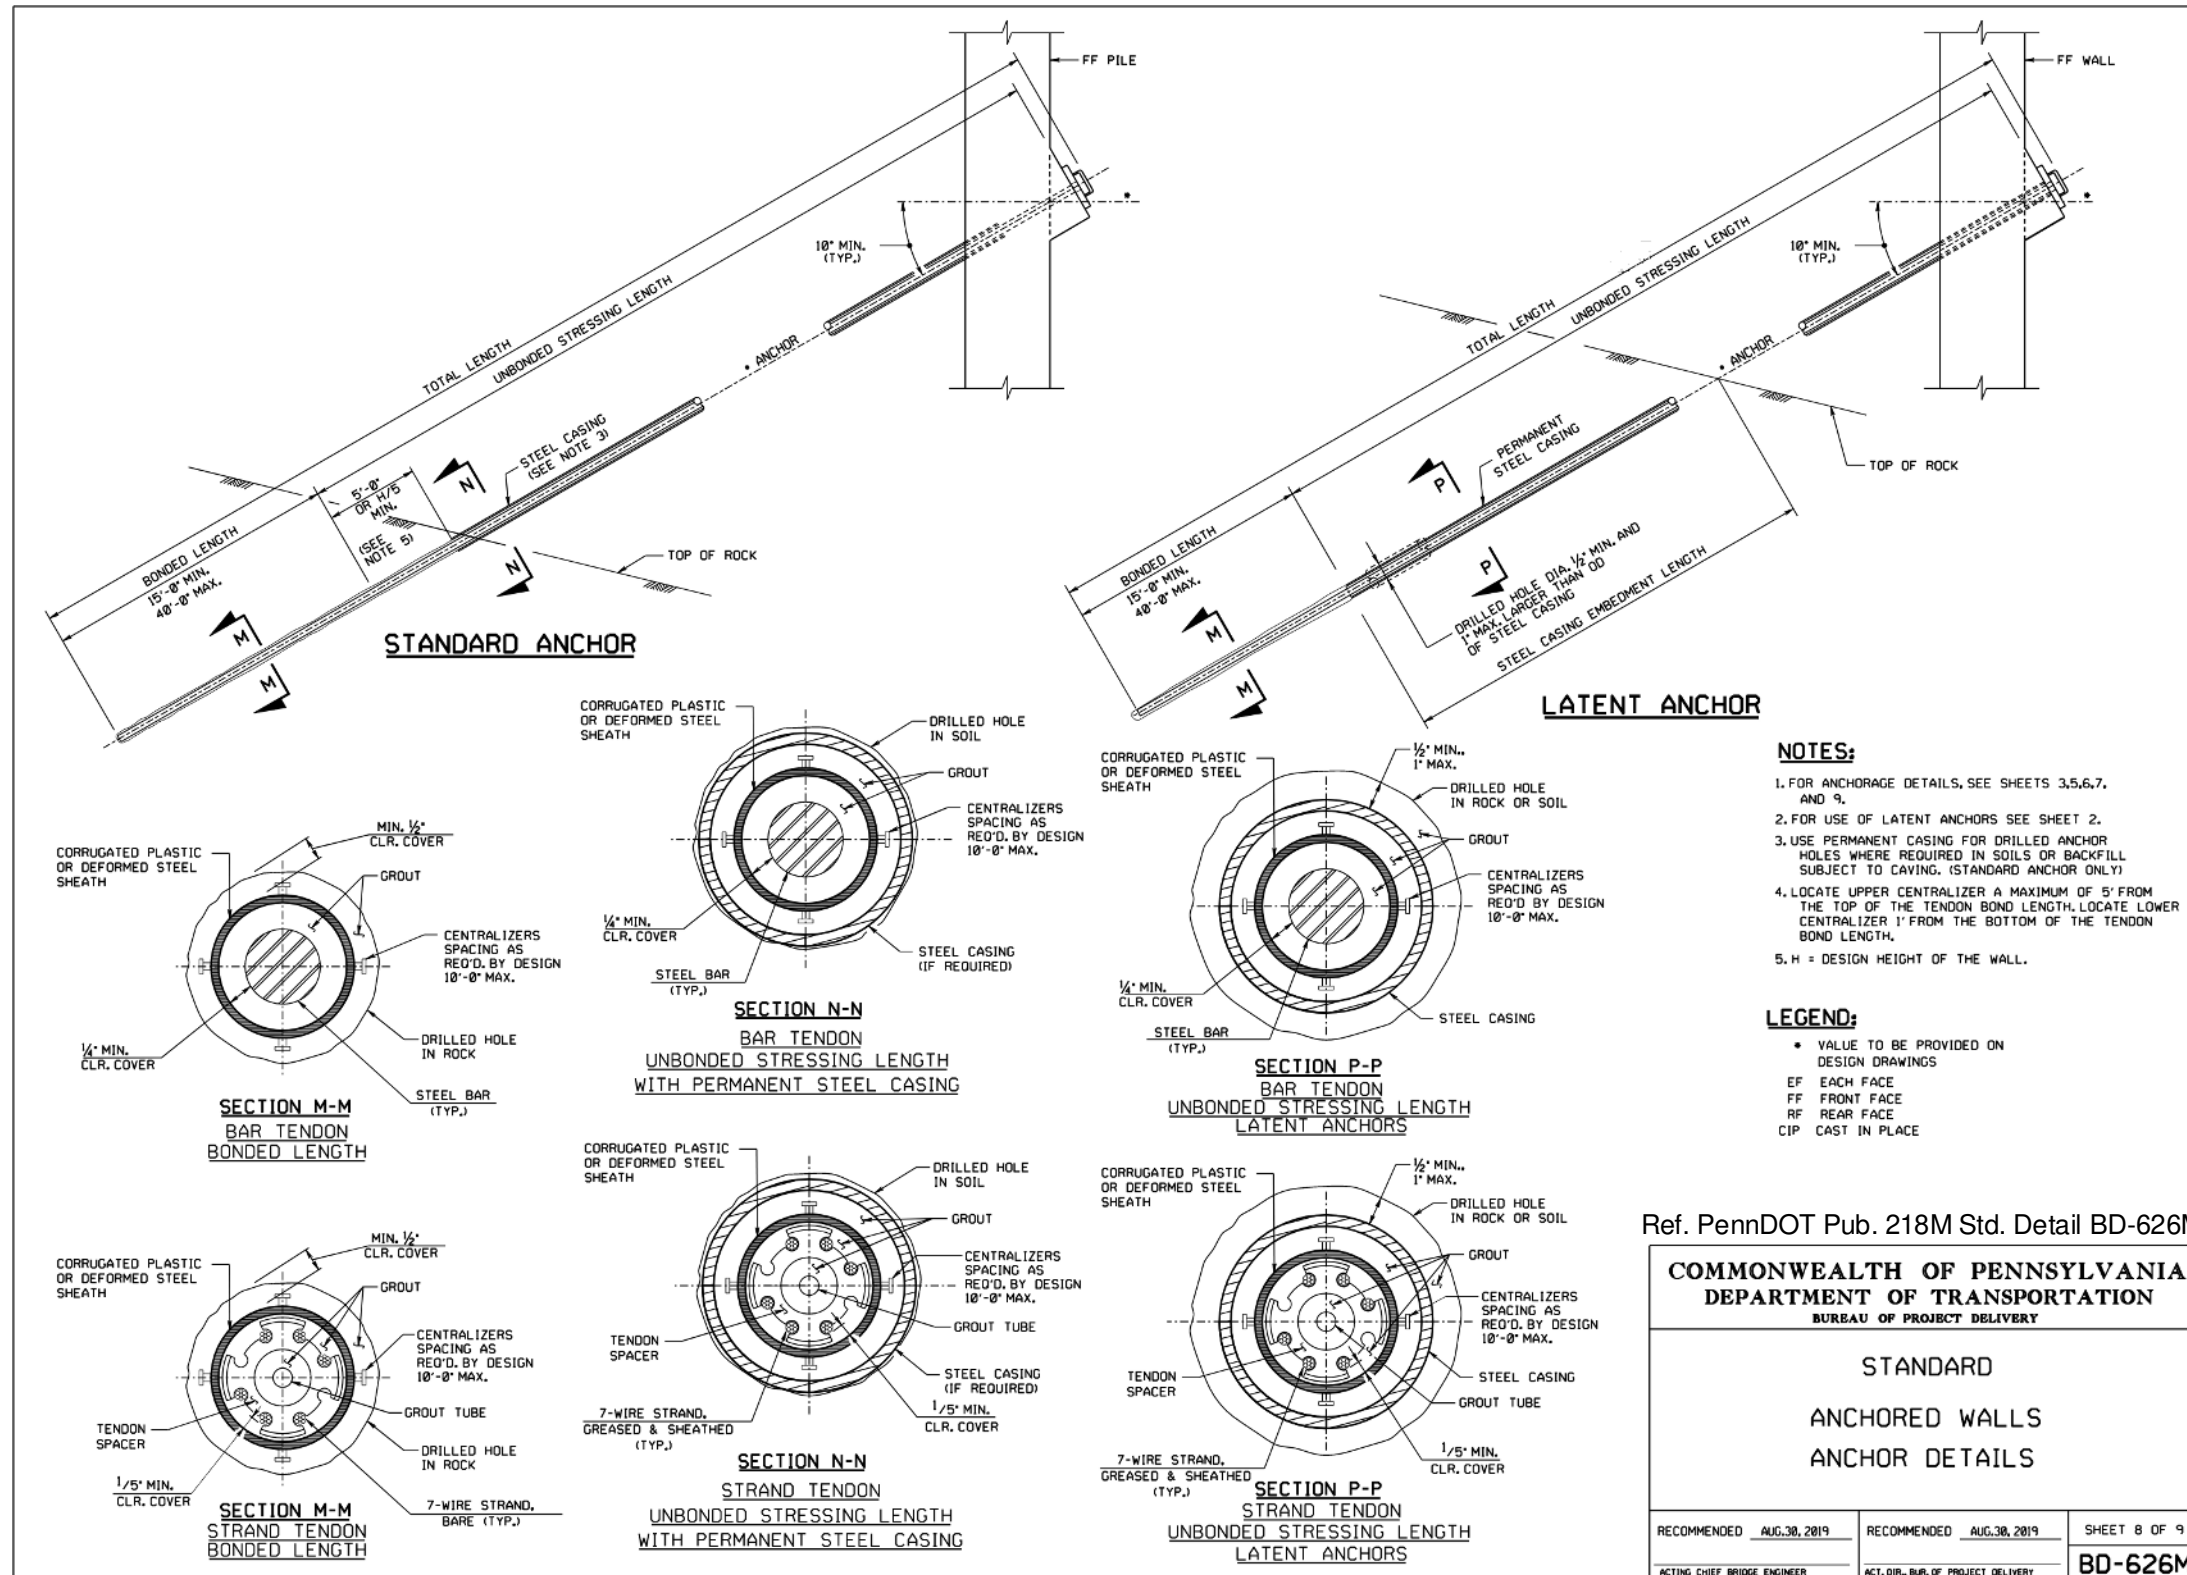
Typical Detail, Anchored Walls (Sheet 8 of 9)
